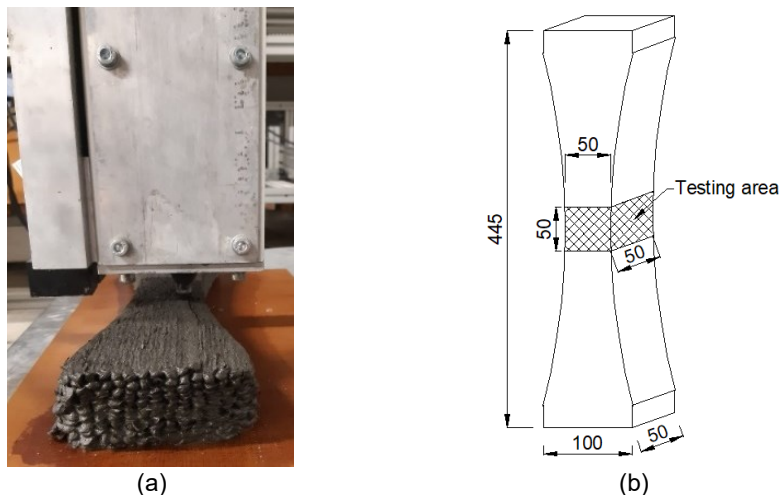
Printing process (a); Shape and dimensions (measurement units are in mm) of the tested specimens (a) [38]
